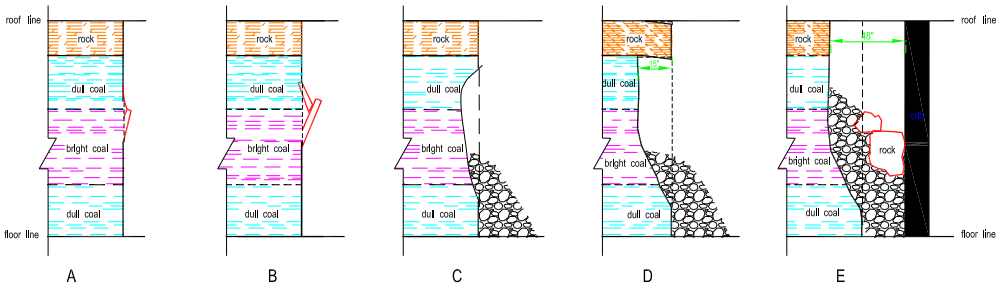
Stages of rib sloughing as the longwall front abutment pressure approaches (Peng, 2007)
